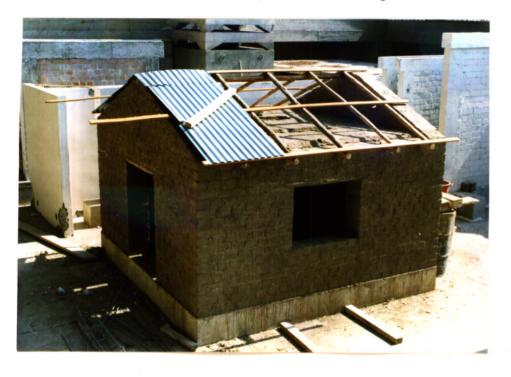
Unreinforced adobe house specimen (typical of the Andes) under construction
